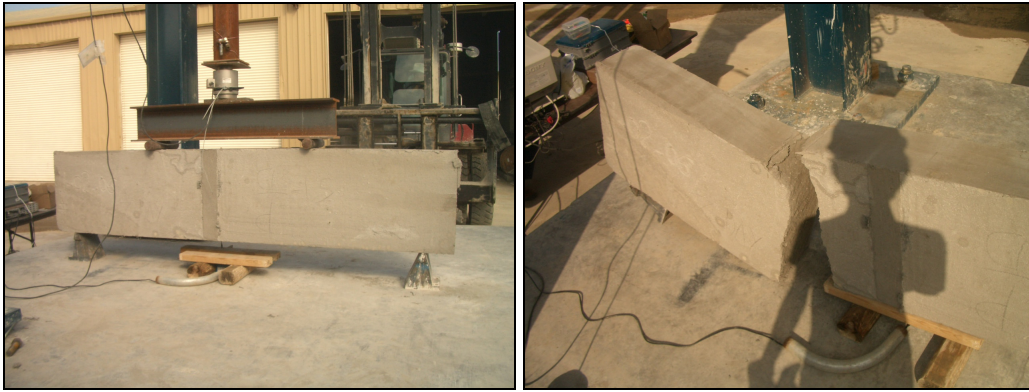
Beam for 2<sup>nd</sup> batch concrete cast on 10/31/06 for 7 day test;
